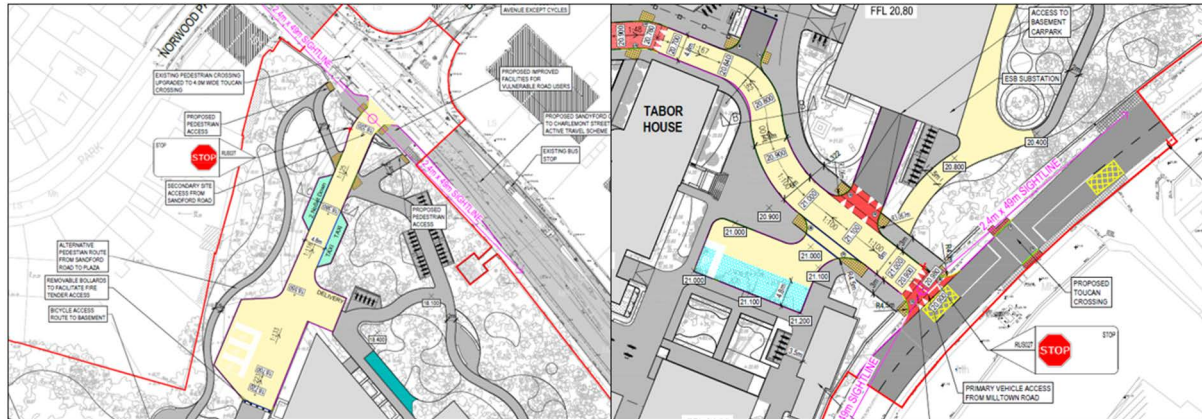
Extract of Subject Site Road Layout [Left: Sandford Road, Right: Milltown Road]
